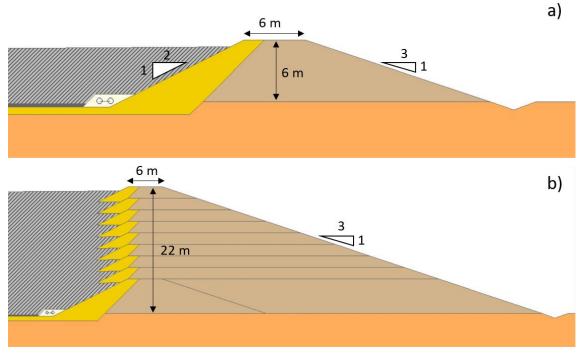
Perimeter Embankment Cross-Section. a) Stage 1. b) Stage 9
